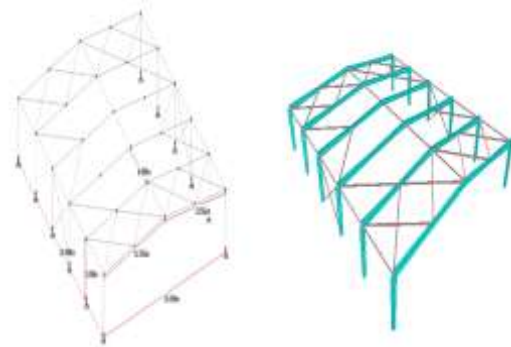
Elevation and 3D model of PEB Structure without Intermediate Support
